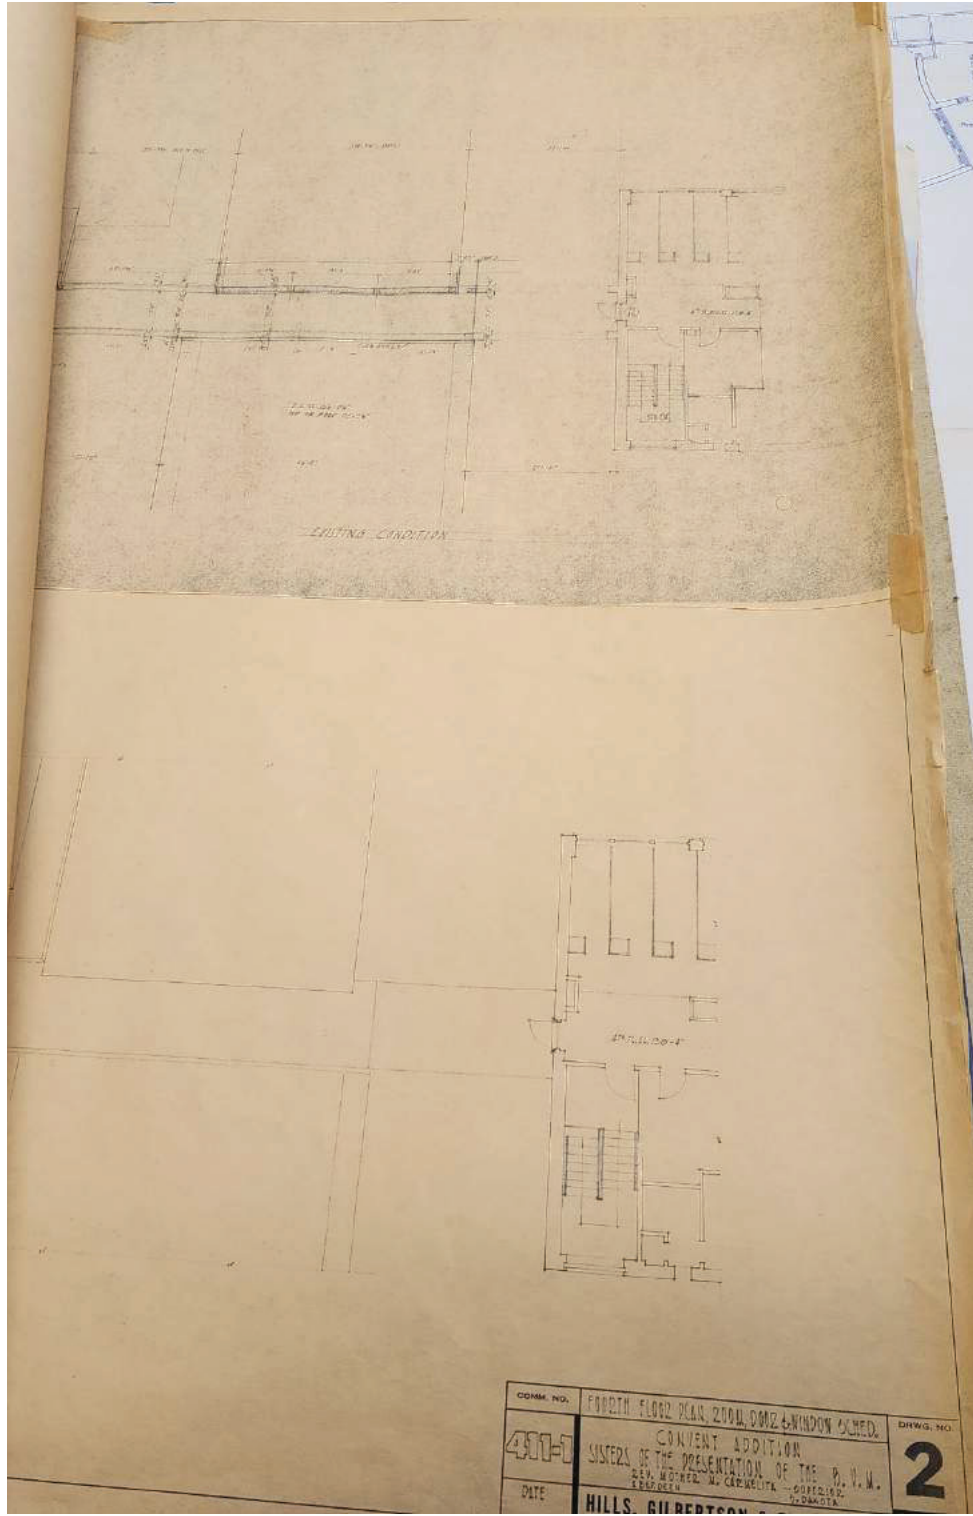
Convent Addition Fourth Floor Plan, Room, Door and Window Schedule
